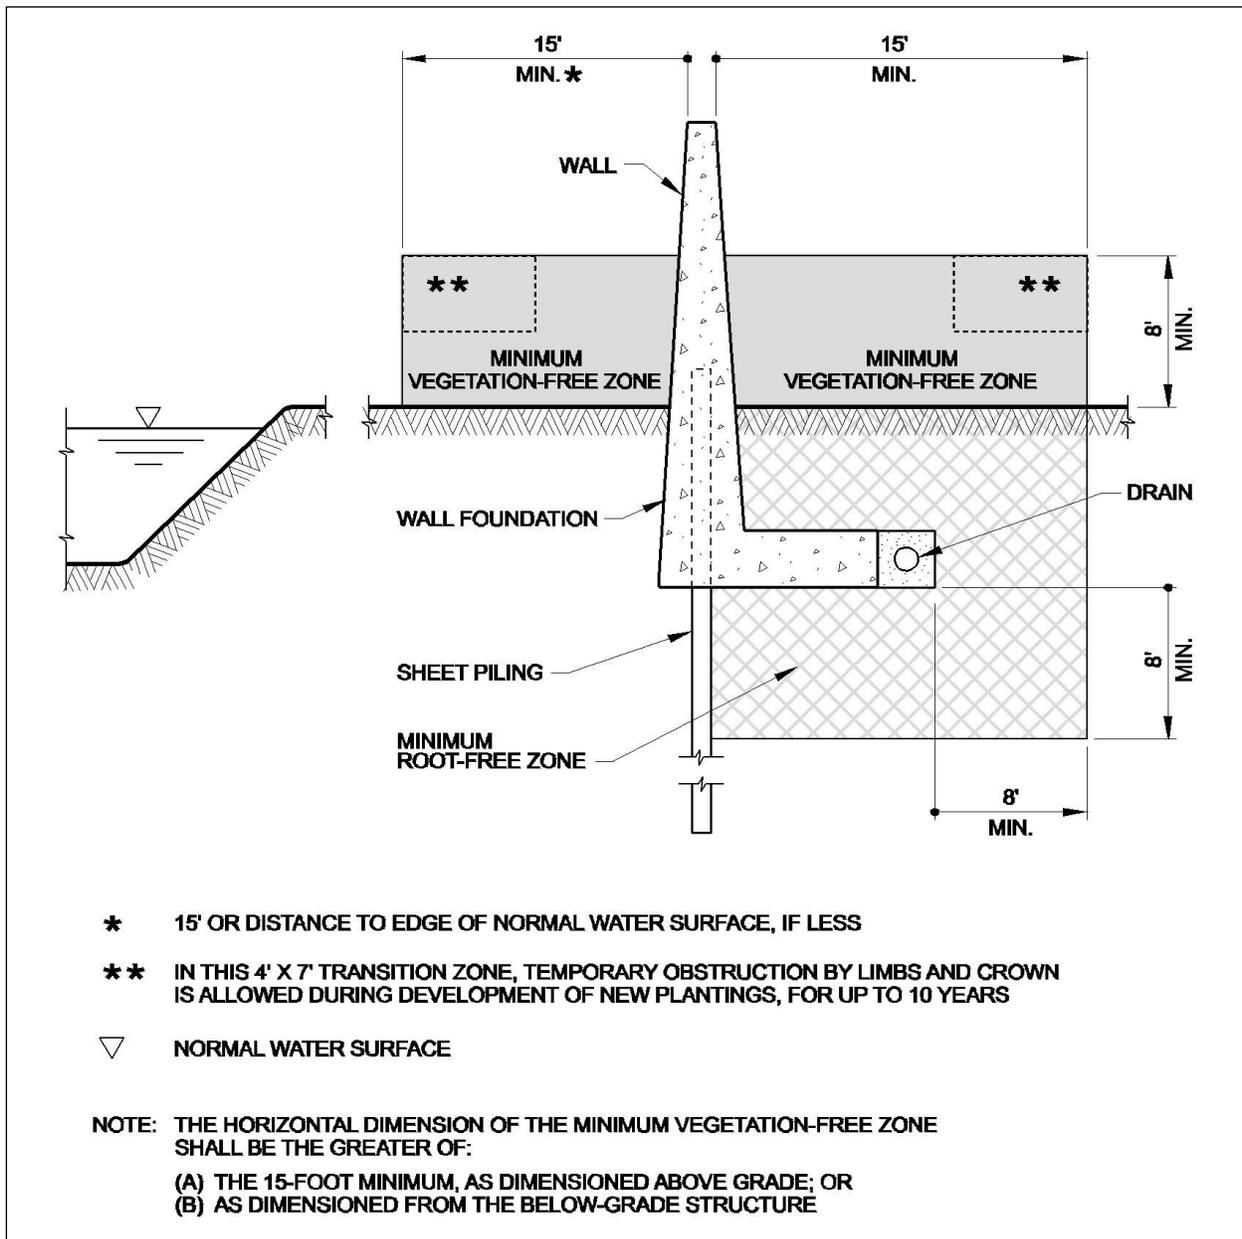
Cantilever-I Type Sheet-Piling Floodwall with Drain.
